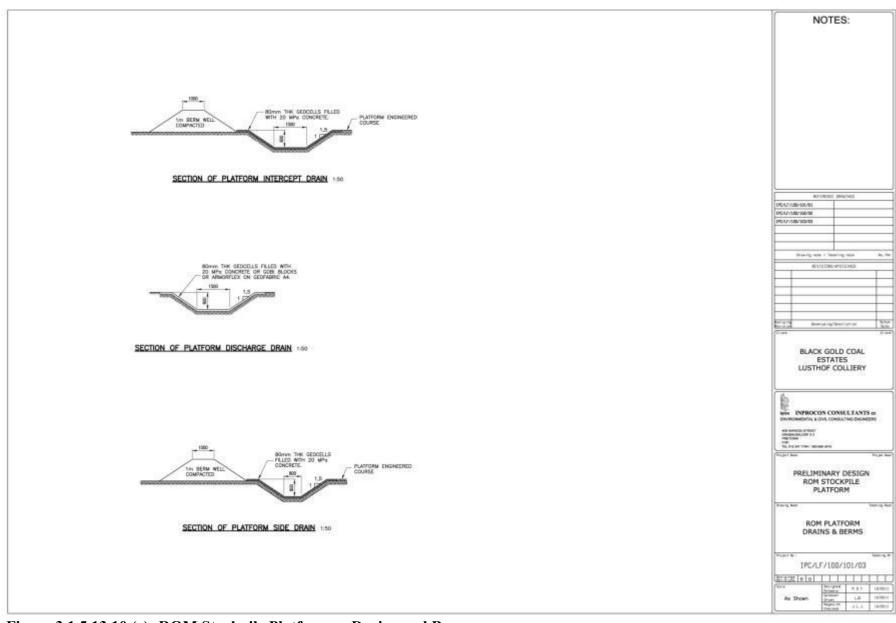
(c): ROM Stockpile Platform - Drains and Berms.
